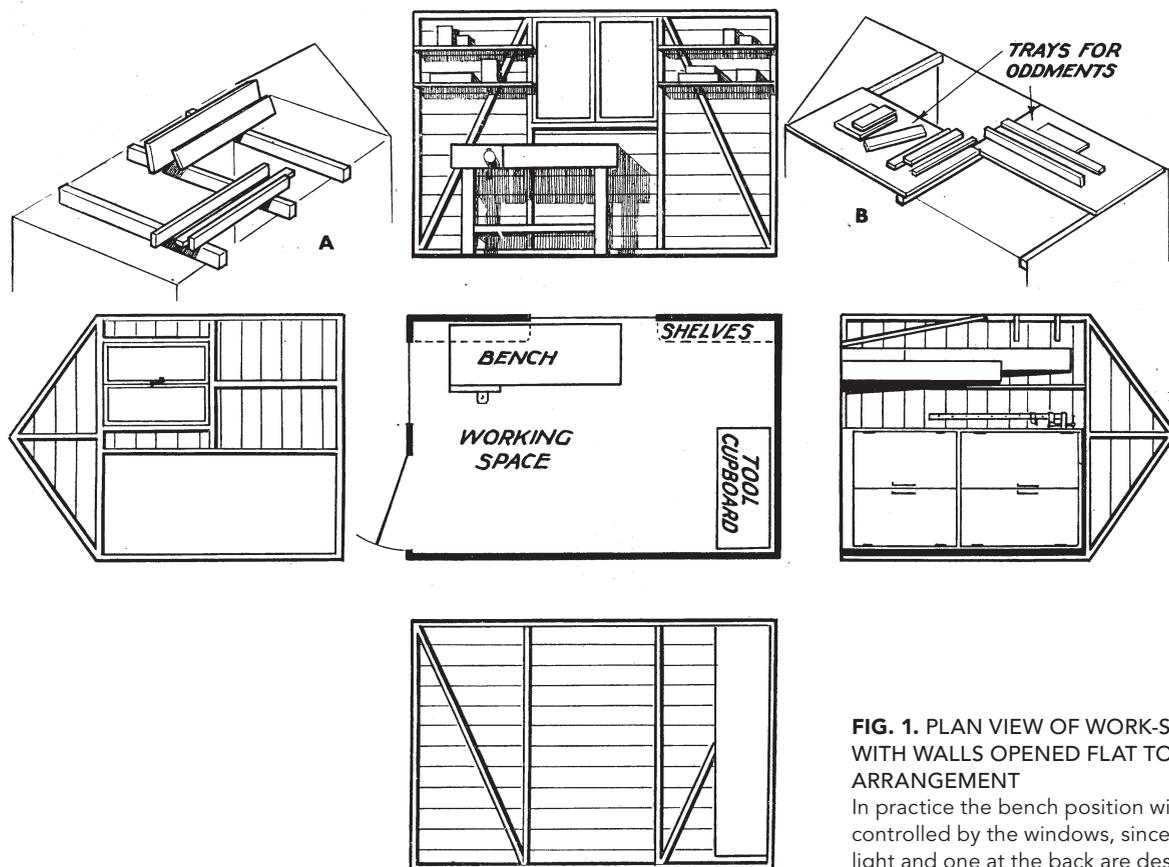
PLAN VIEW OF WORK-SHED WITH WALLS OPENED FLAT TO SHOW ARRANGEMENT
